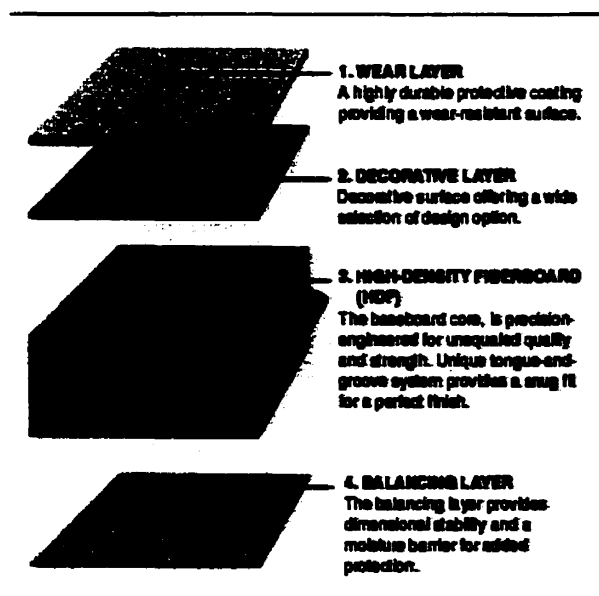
The structure of laminated flooring. (Source: Quickstyle, 1998)
